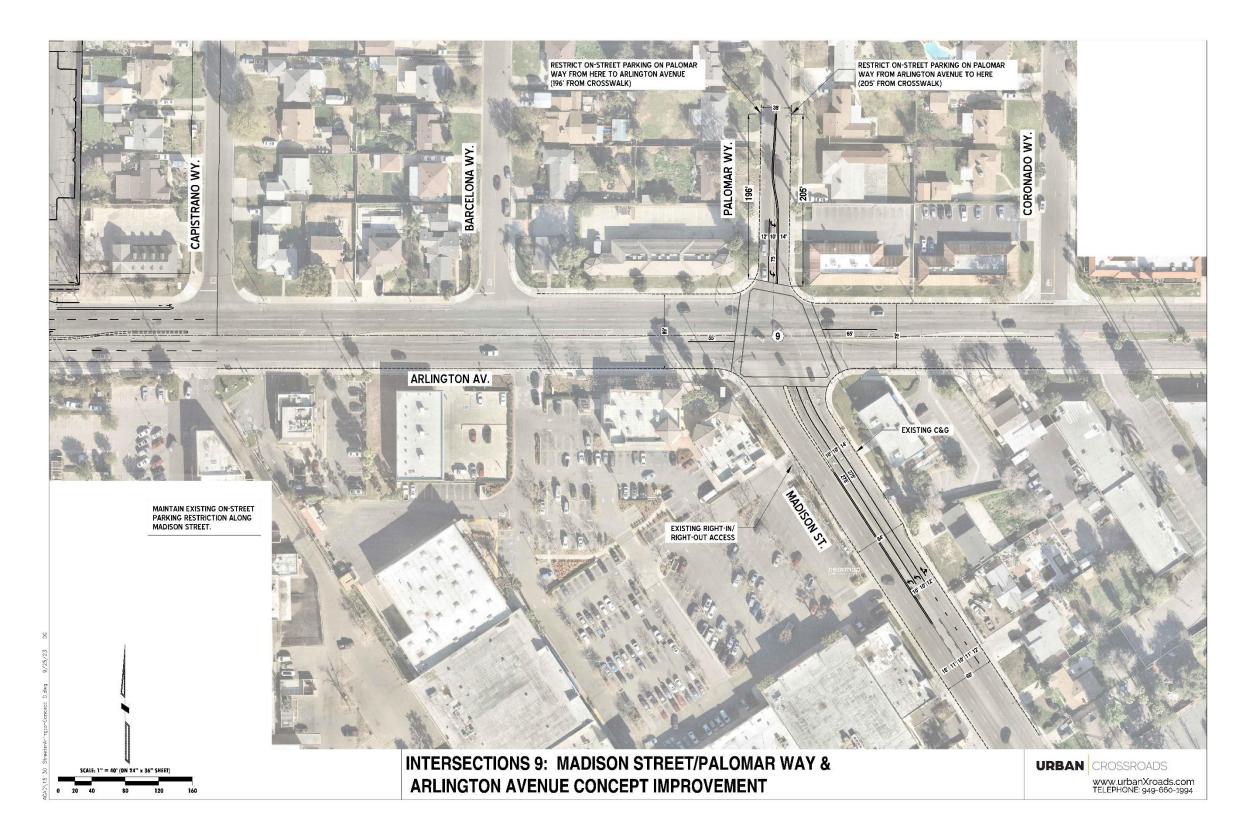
CONCEPT STRIPING PLANS (PAGE 4 OF 4)
